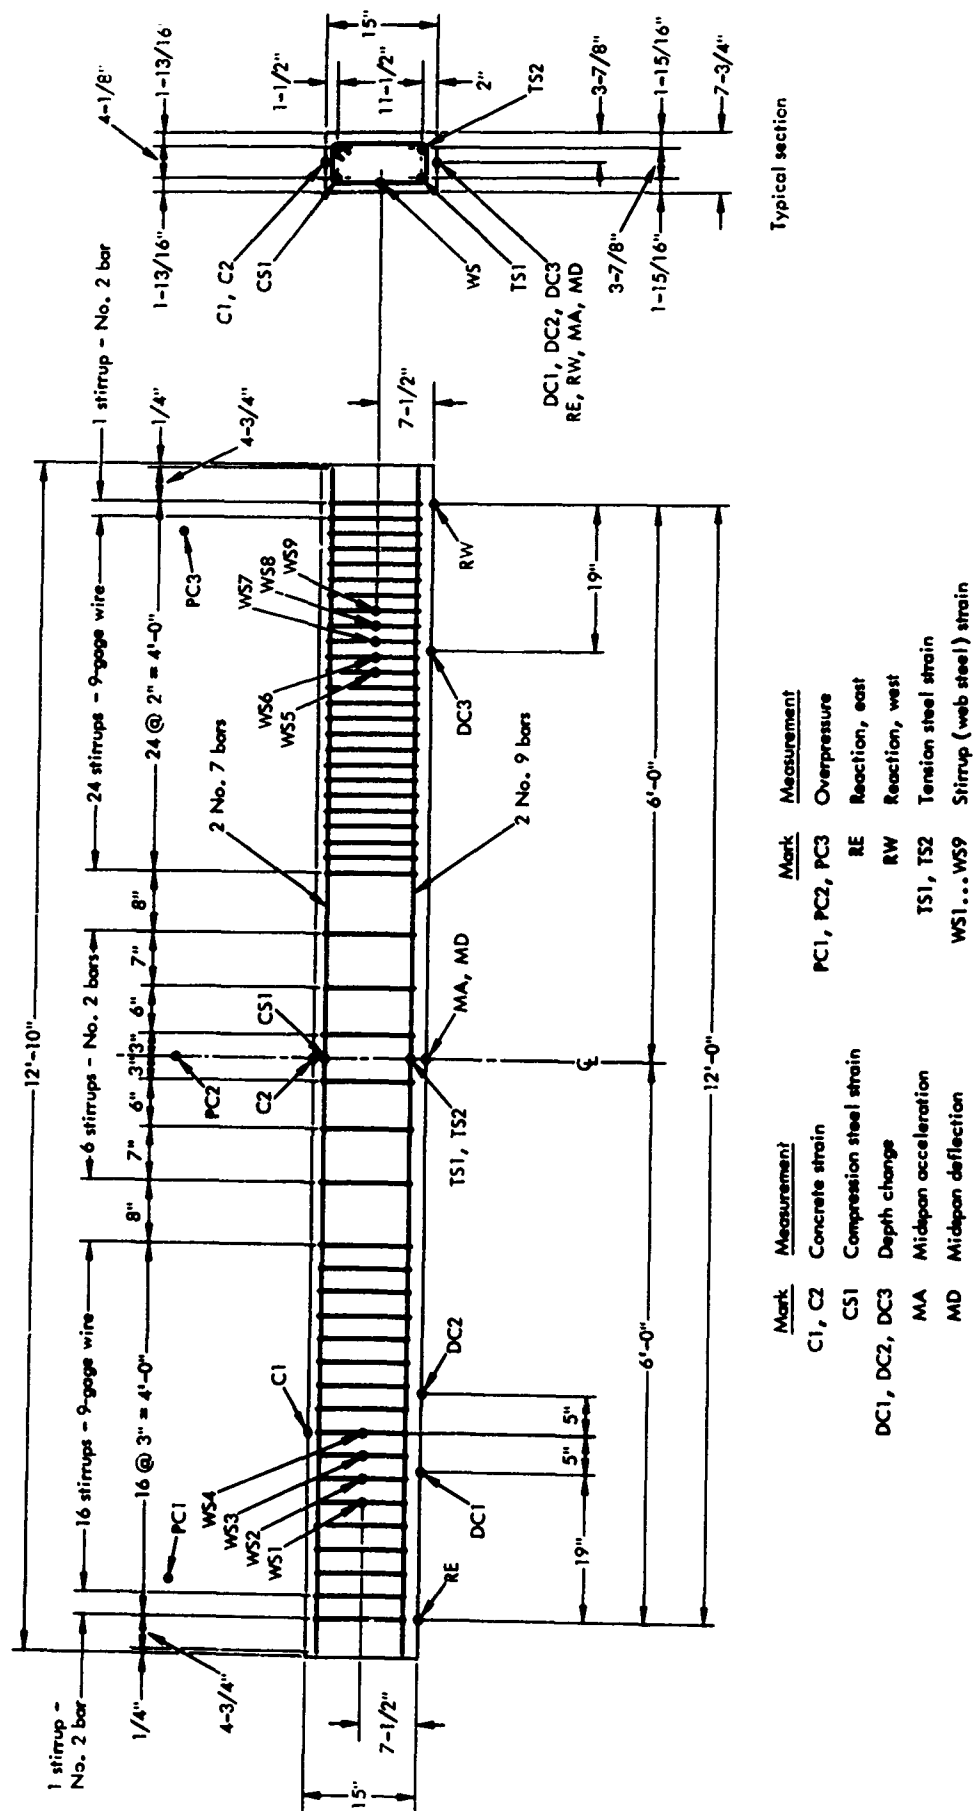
Details and instrumentation, beam Type II - 3-inch spacing between stirrups in the critical region.
